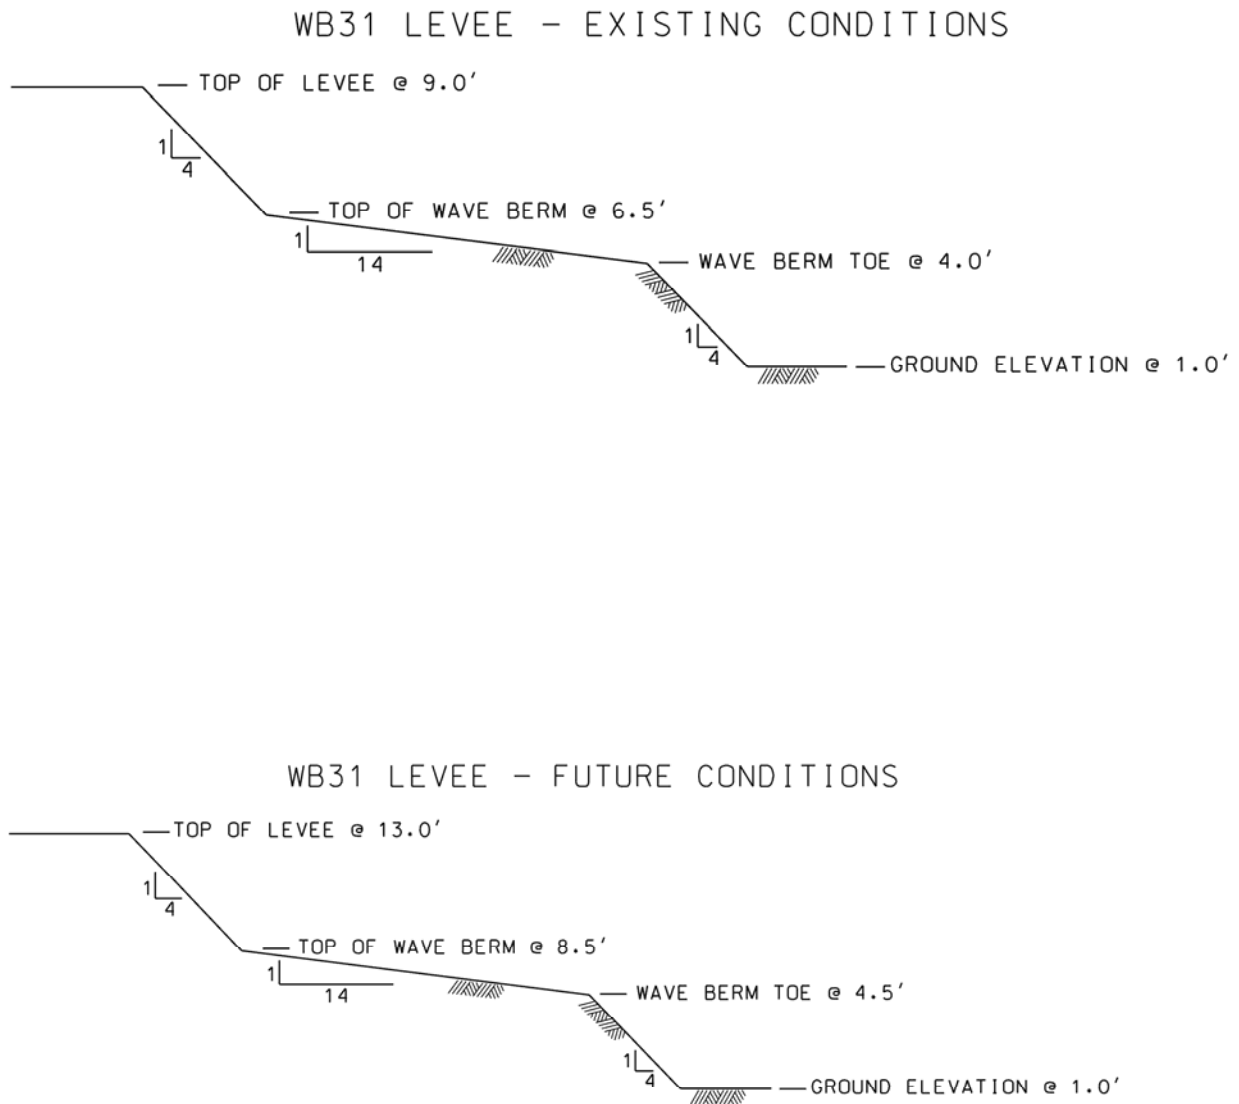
Typical Design Cross Section for WB31 – Mississippi River to US90 Levees for existing (upper panel) and future conditions (lower panel)
